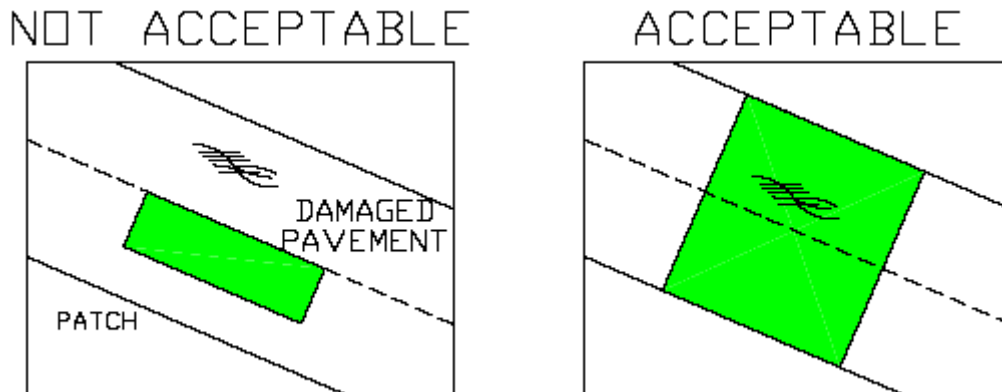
Example 12: Damaged pavement within 10 feet of a patch must also be patched.
